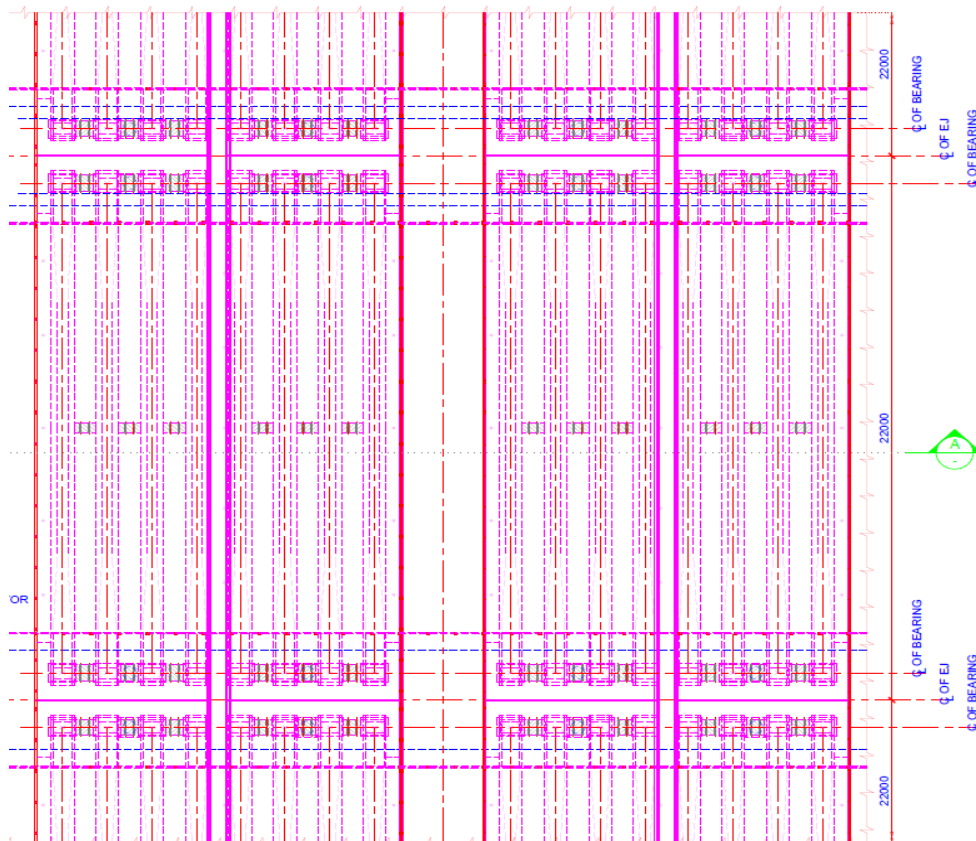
Typical Plan of Rail bridge at Flood regulator
